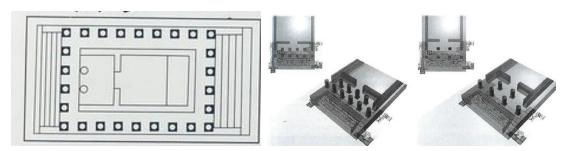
Drawings of the podium temple: a) existing restitution drawing, b) existing models (Alexandria Troas excavation archive).
